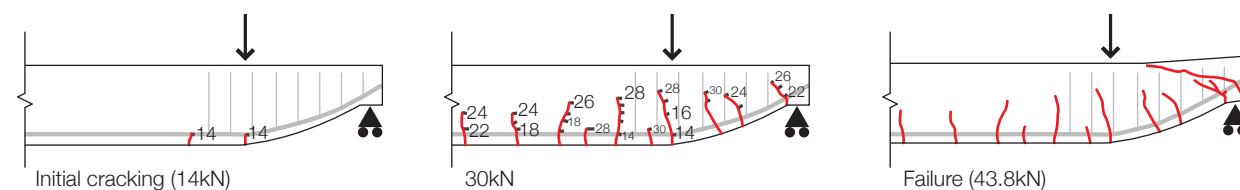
Crack distribution and failure mode in Beam 9\_3\_CFP\_V.
